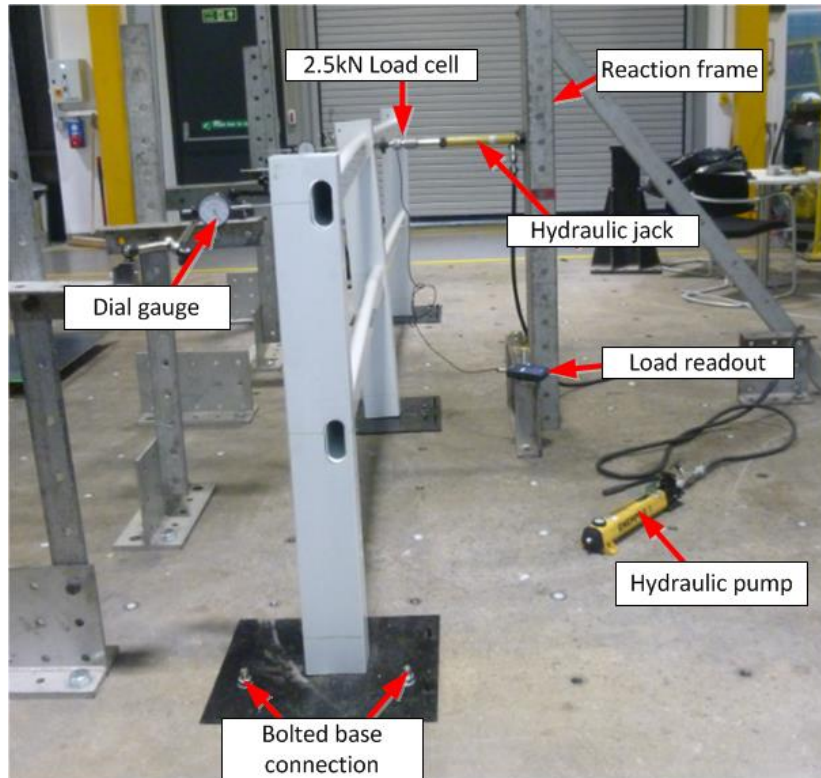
Load test on the two-bay PVC fence with a 2000 mm post spacing (First set of load tests)
